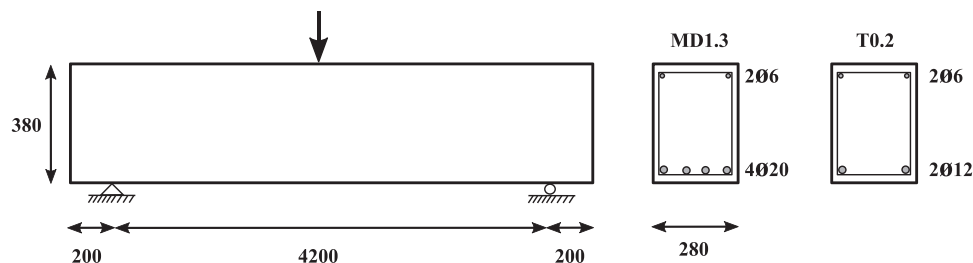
Geometric, loading and reinforcement layout of reinforced concrete beams MD1.3 and T0.2. Dimensions in mm.
